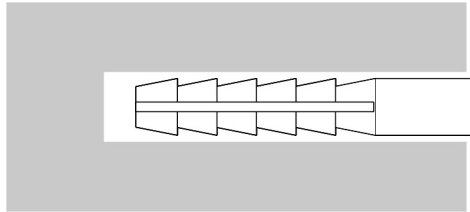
Mounting SMT-R2000 on a Concrete Wall (2)
